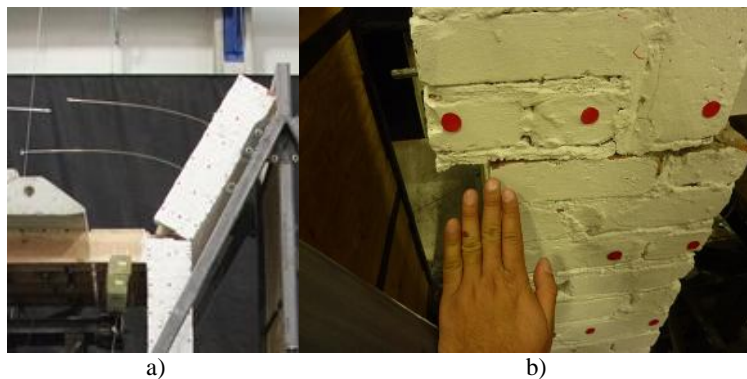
Final damage state of parapets: a) Wall 1 and b) Wall 2
